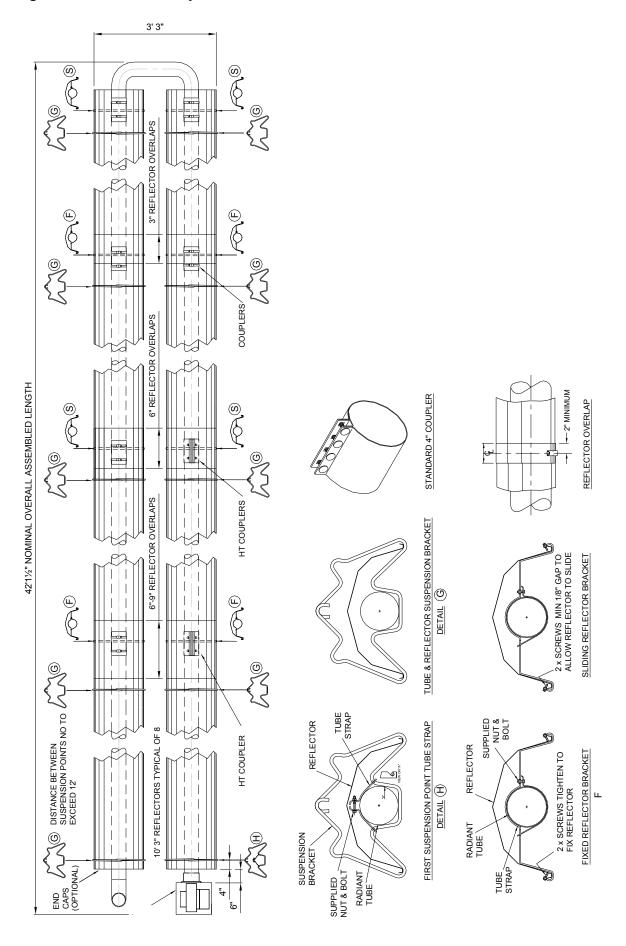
Heater Assembly: Model U tube 170-U80 and 200-U80
